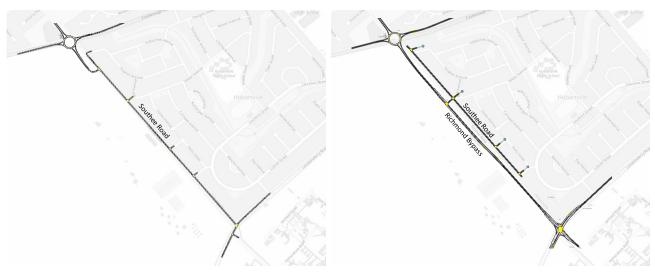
Richmond bypass along Southee Road (Location 9): Stage 2A Southee Road alignment (left) and proposed Richmond bypass (right)
